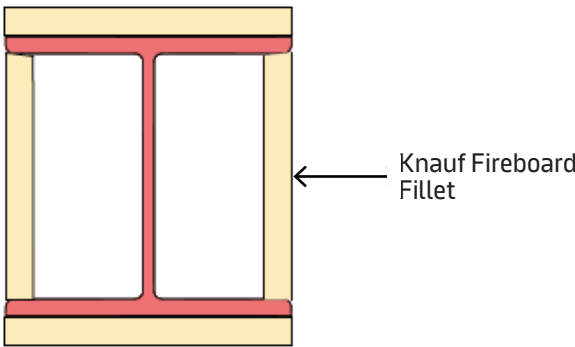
Plan view of Universal Steel Column showing location of Knauf Fireboard Fillets
